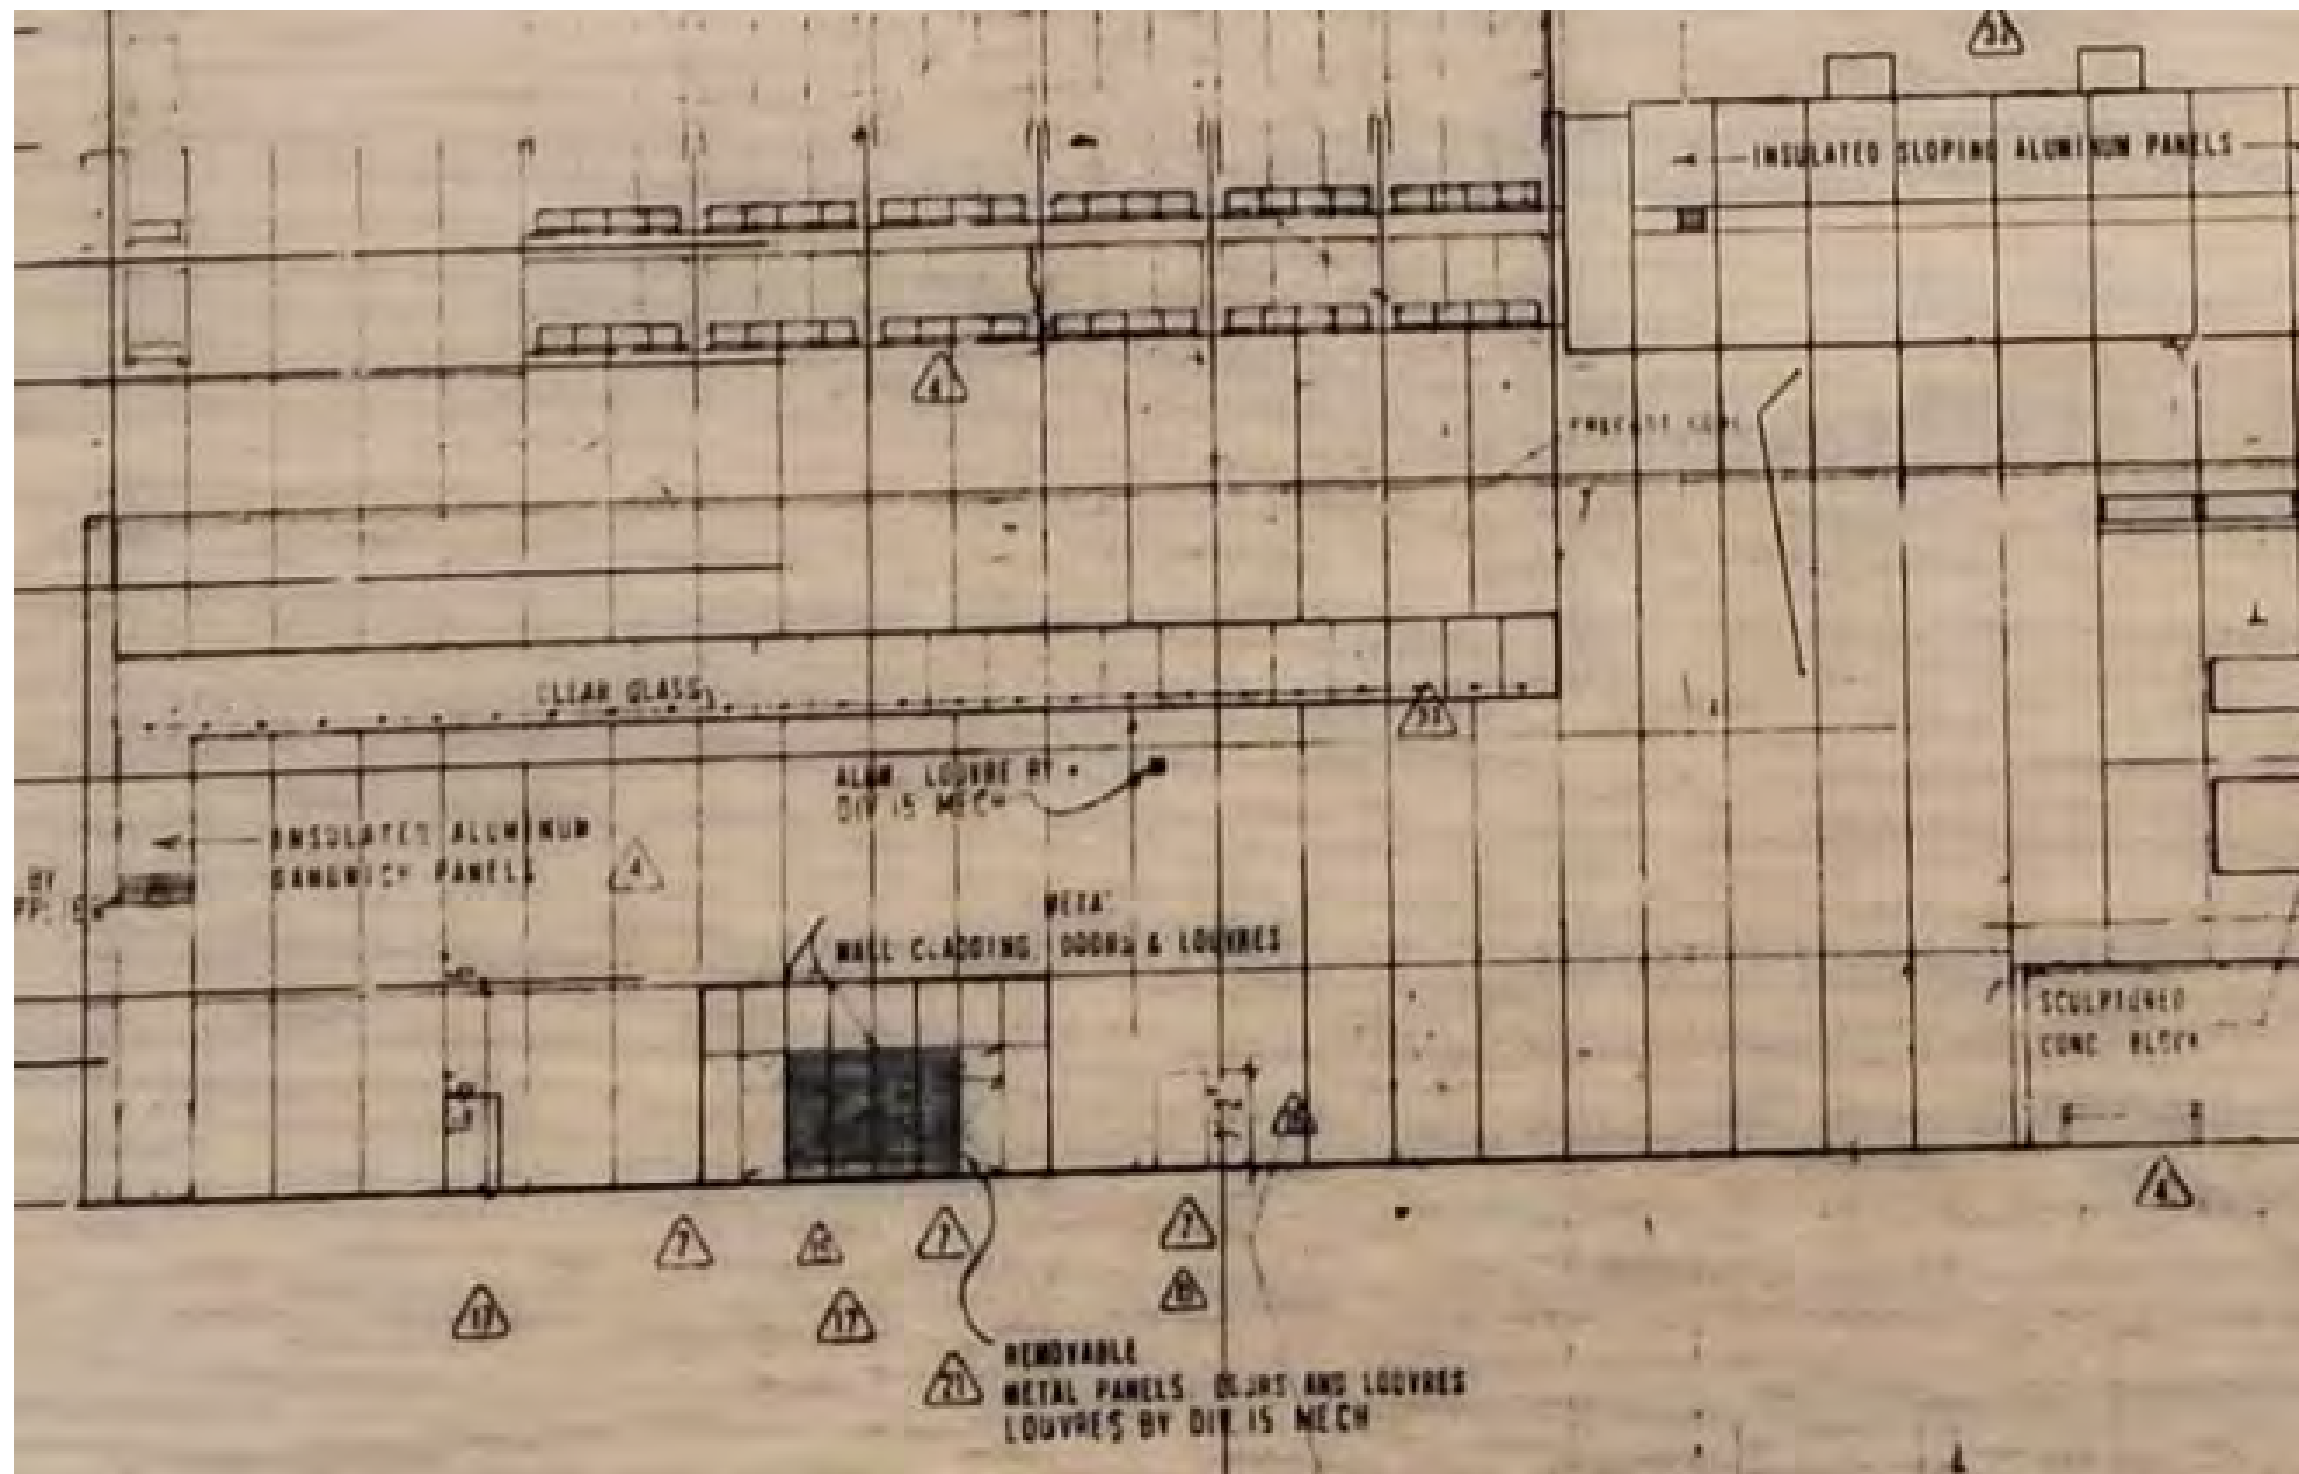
Detail of drawing showing east elevation of the podium, south half 1973 (Campeau Corporation).
